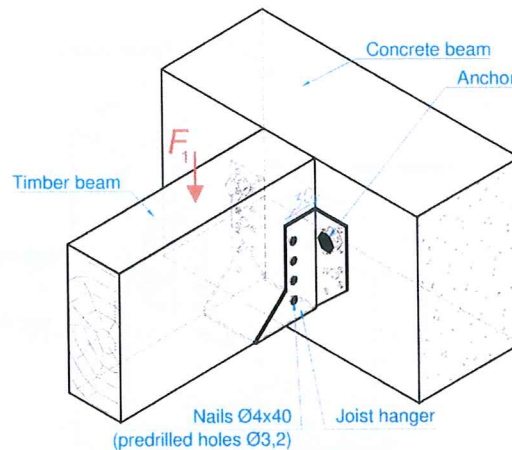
Typical installation of the joist hanger in the timber beam to concrete member connections
